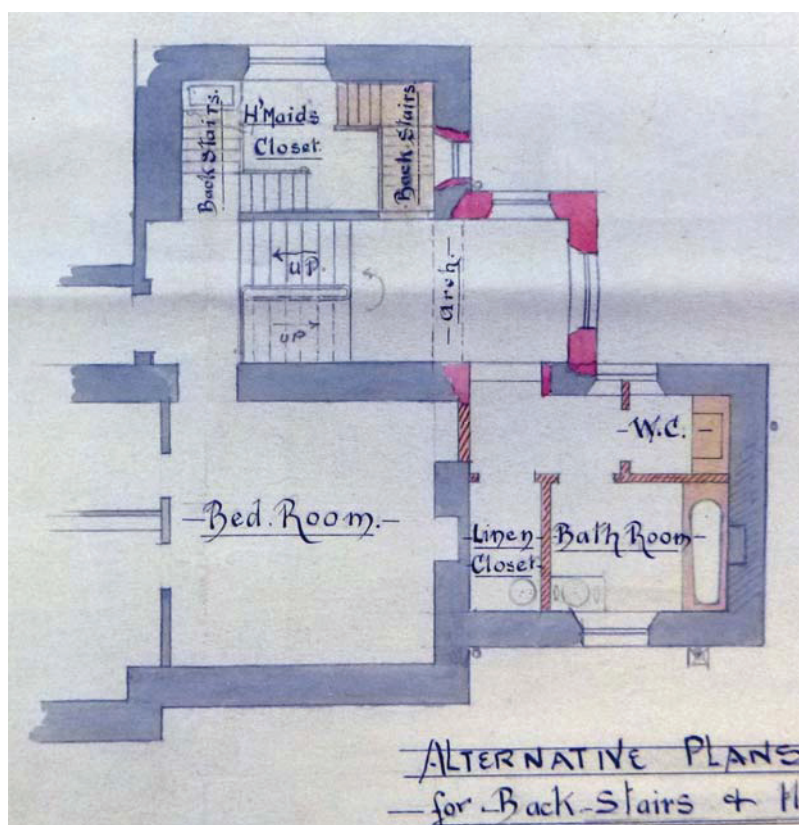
Proposed plans for back stairs and housemaid's closet showing changes in red, 1889
